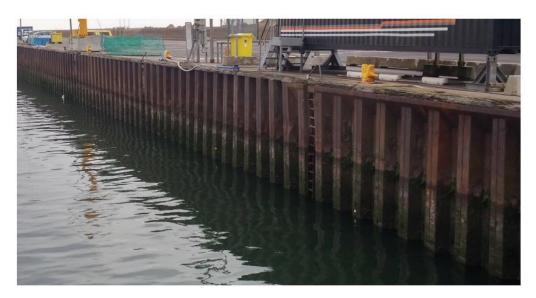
Sheet Pile wall stepped out from Quay Wall
